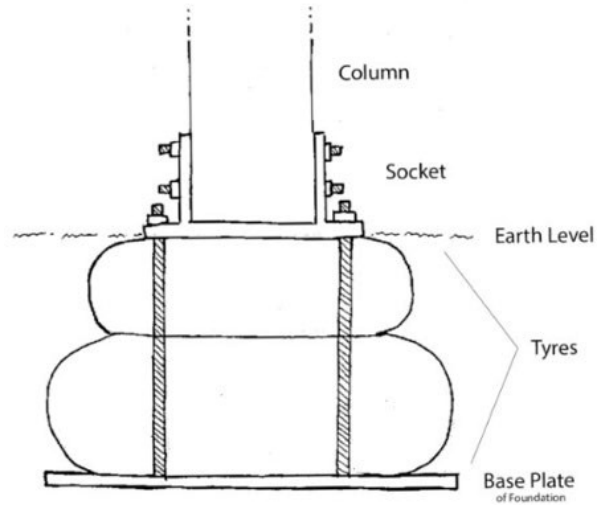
Diagram of Small building foundation using tires (*Critical Concrete 2019*)
